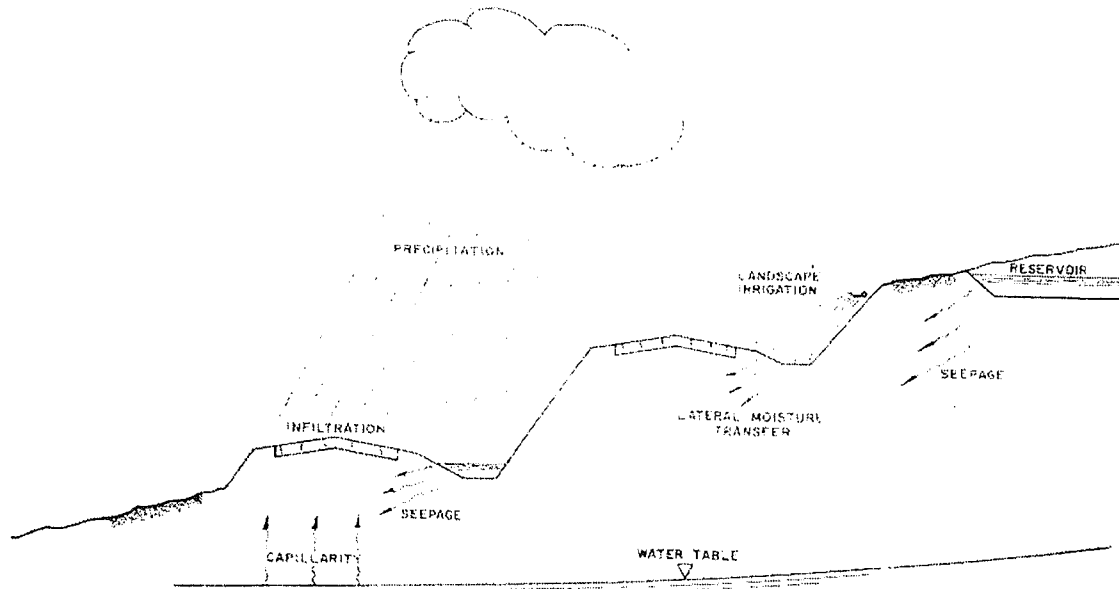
Sources of moisture in the pavement structure (FHWA 1973).
